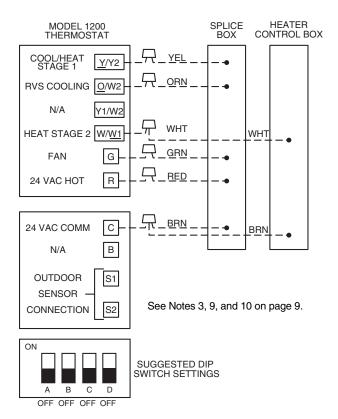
Single-Speed Packaged Heat Pump with Single-Stage Electric Heat — Model 1200 Thermostat
